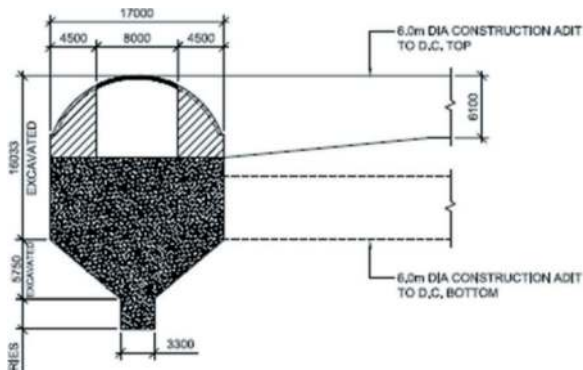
Cross section of desilting chamber showing pilot and arch slashing.
